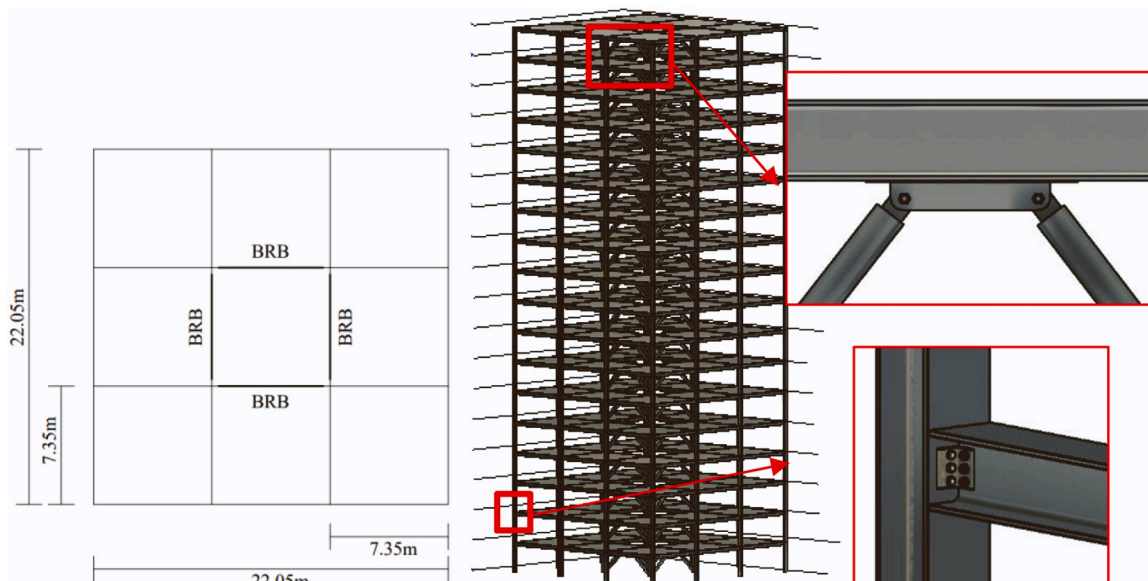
18-storey case-study building with traditional bolted connection (the connections shown refer to the X and Y directions).
